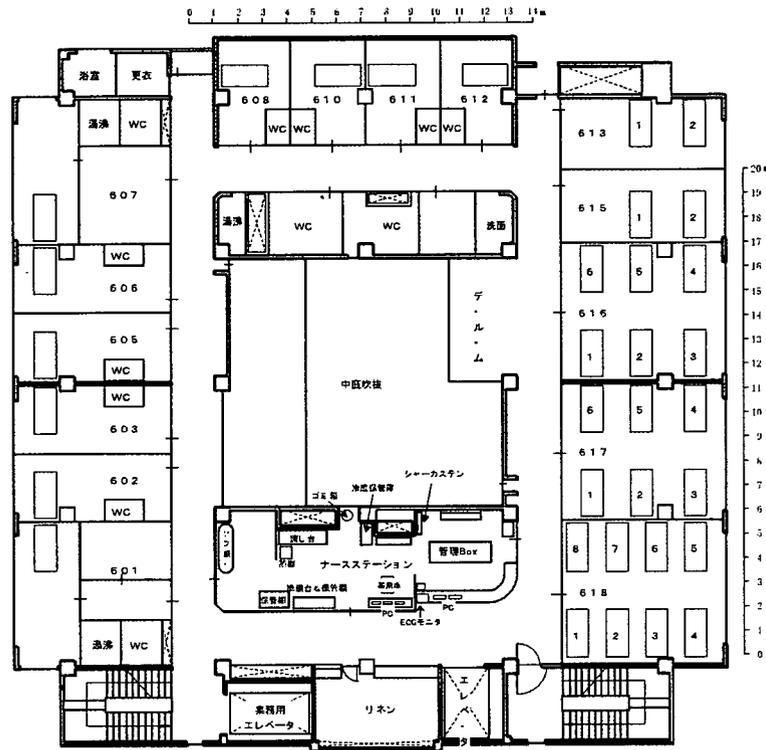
The floor plan of ward for adult diseases on the sixth floor.
